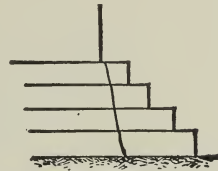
Footing Crack Caused by Too Great Projection.
